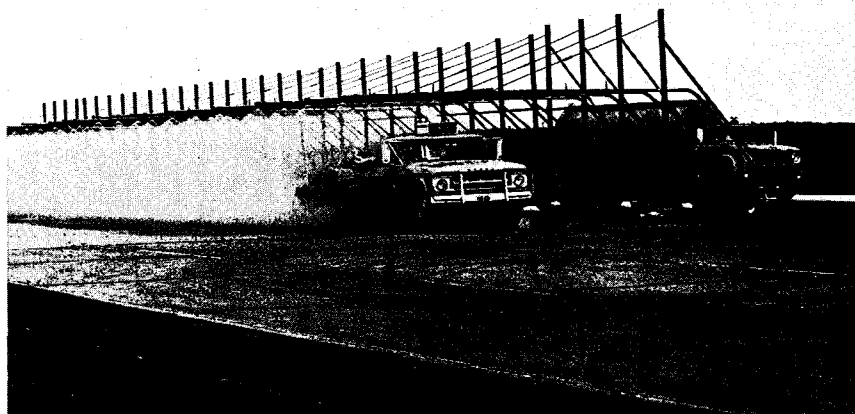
Equipment used for wetting and friction testing of the surfaces.
